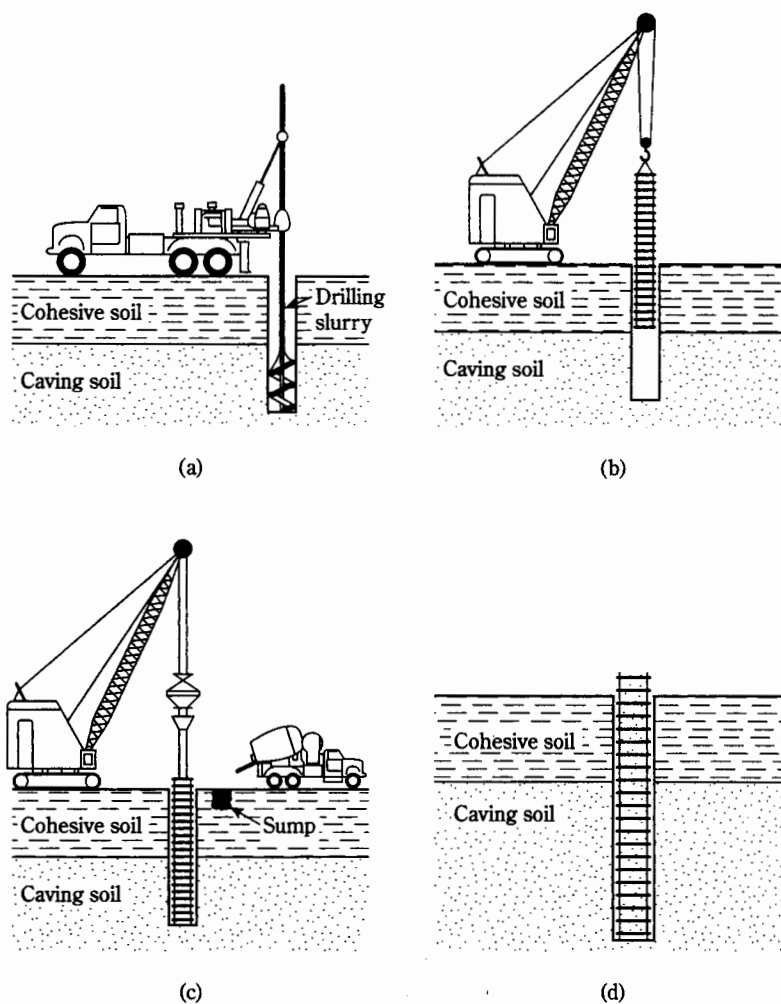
Slurry method of construction: (a) drilling to full depth with slurry; (b) placing rebar cage; (c) placing concrete; (d) completed shaft (after O'Neill and Reese, 1999)
